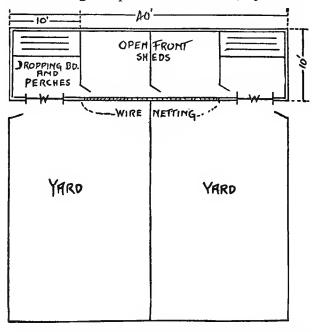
Ground Plan of a Two-Pen Scratching House.
